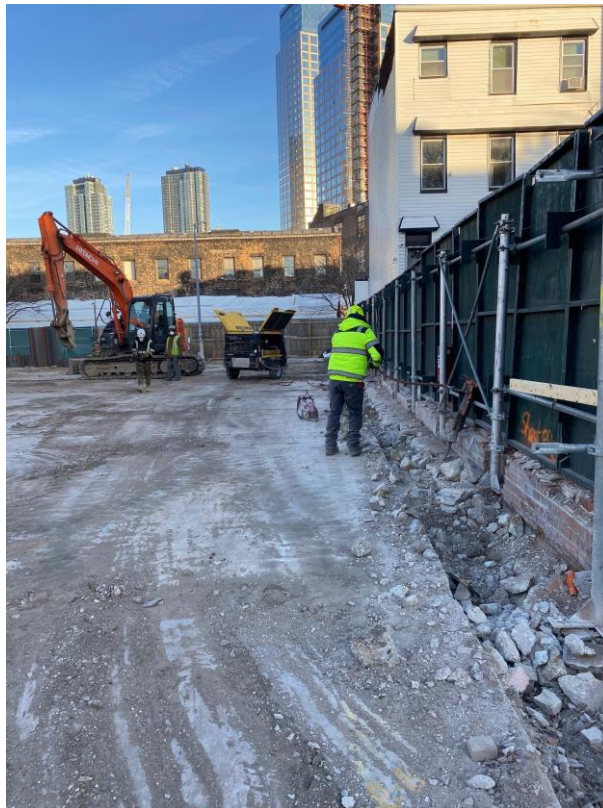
View of contractor jack hammering along northeastern perimeter of Site in preparation for installation of the soil mix wall.
